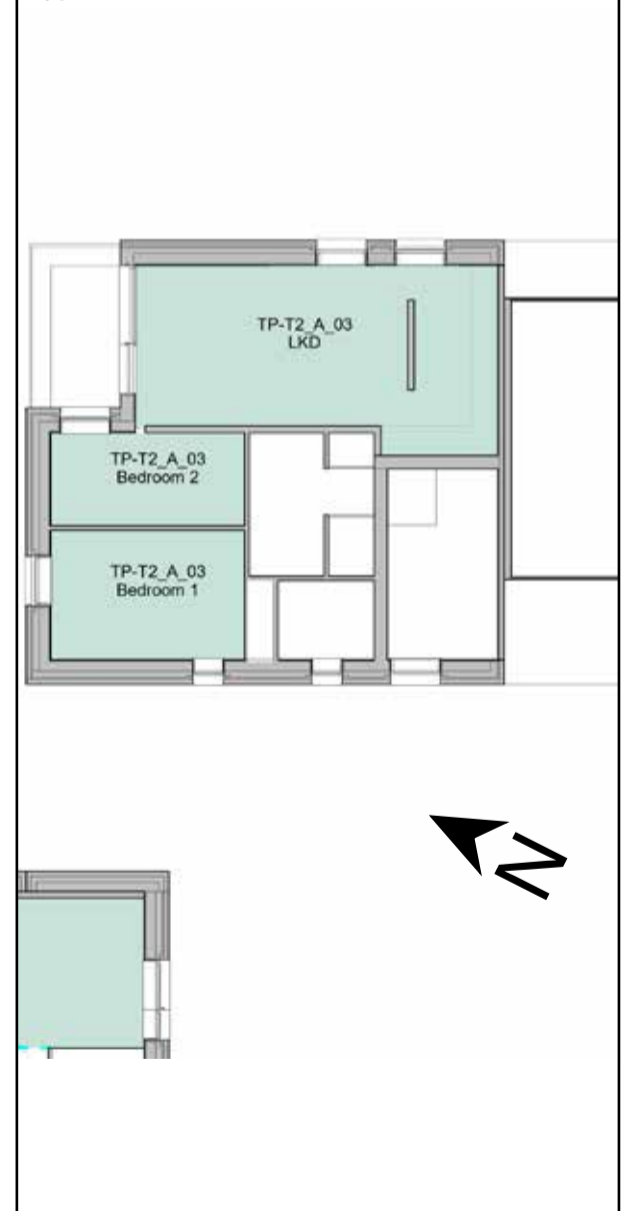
Triplex TP-T2_A - Second Floor Typical
